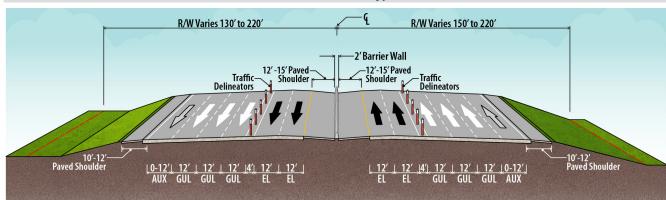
Segment B/C - I-275 from I-375 to north of 4th Street Typical Section
